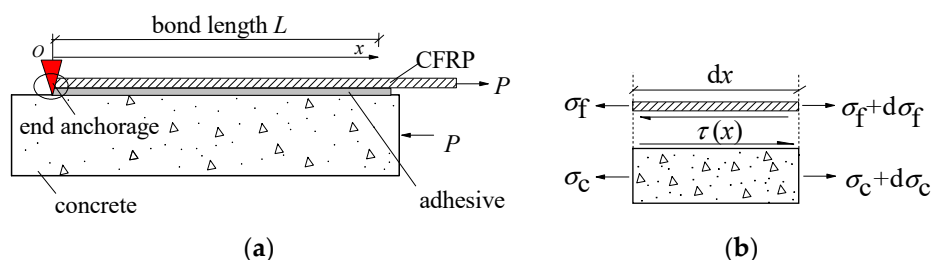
Single-lap shear test of CFRP-to-concrete bonded joints with end anchorage: (a) single-lap shear tests model; (b) Development of stress in CFRP–concrete joint.
